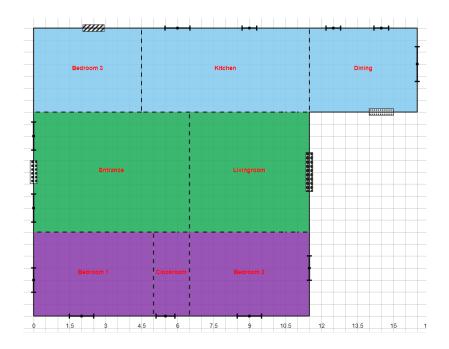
Floor plan of the 3-D house model divided by three thermal zones.
